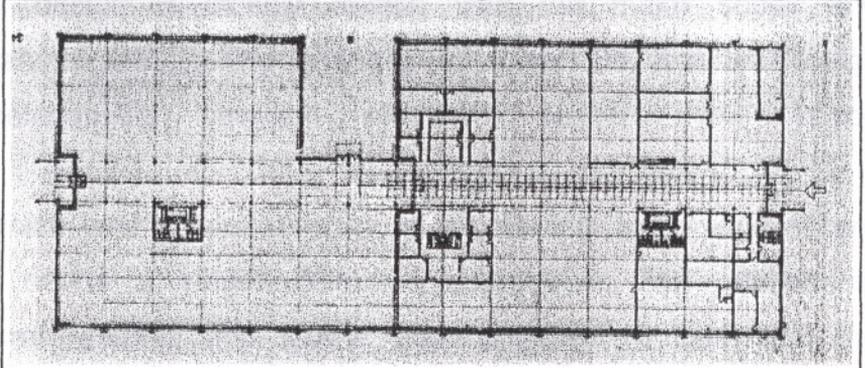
Plan of Laboratories and Corporate Facility for PA Technology, Princeton, New Jersey, 1984.
